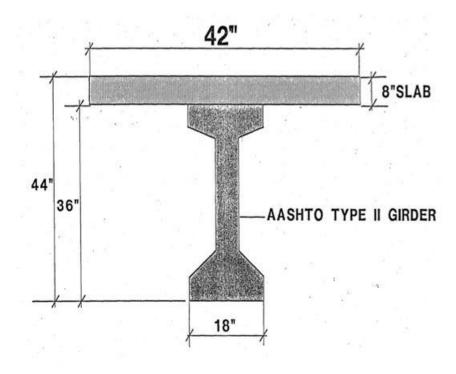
AASHTO Beam Cross Section (Shahawy et al. 1993)
